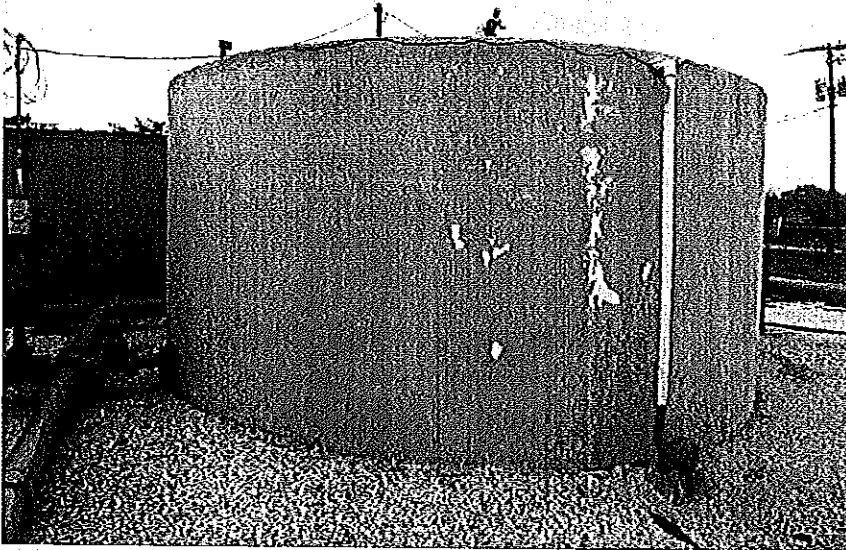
Northwest portion of tank 2. Note the horizontal crack at the wall-to-cap transition.
